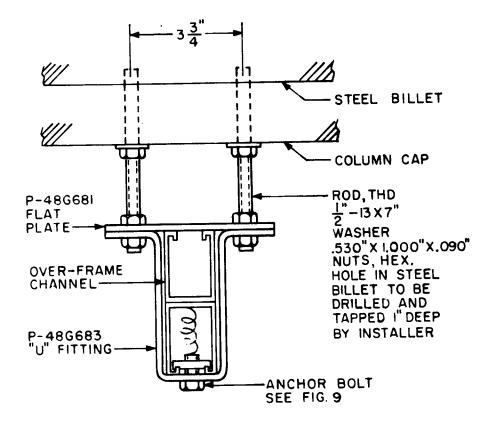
Fastening Overframe Channel to Column Cap (A&M Only)
